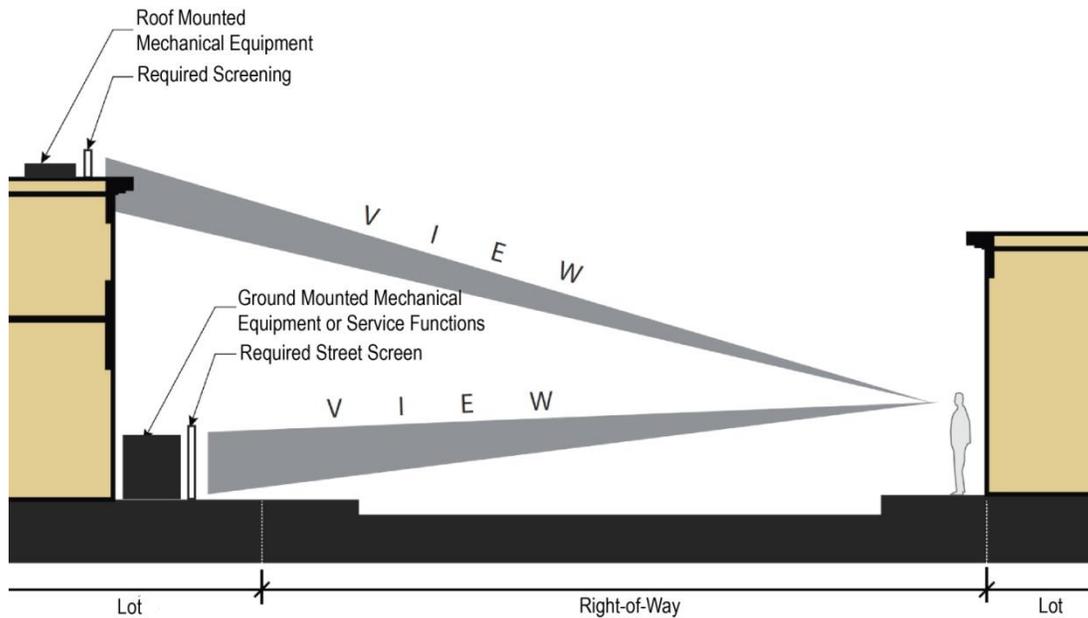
Illustration showing required screening of roof and ground mounted equipment
